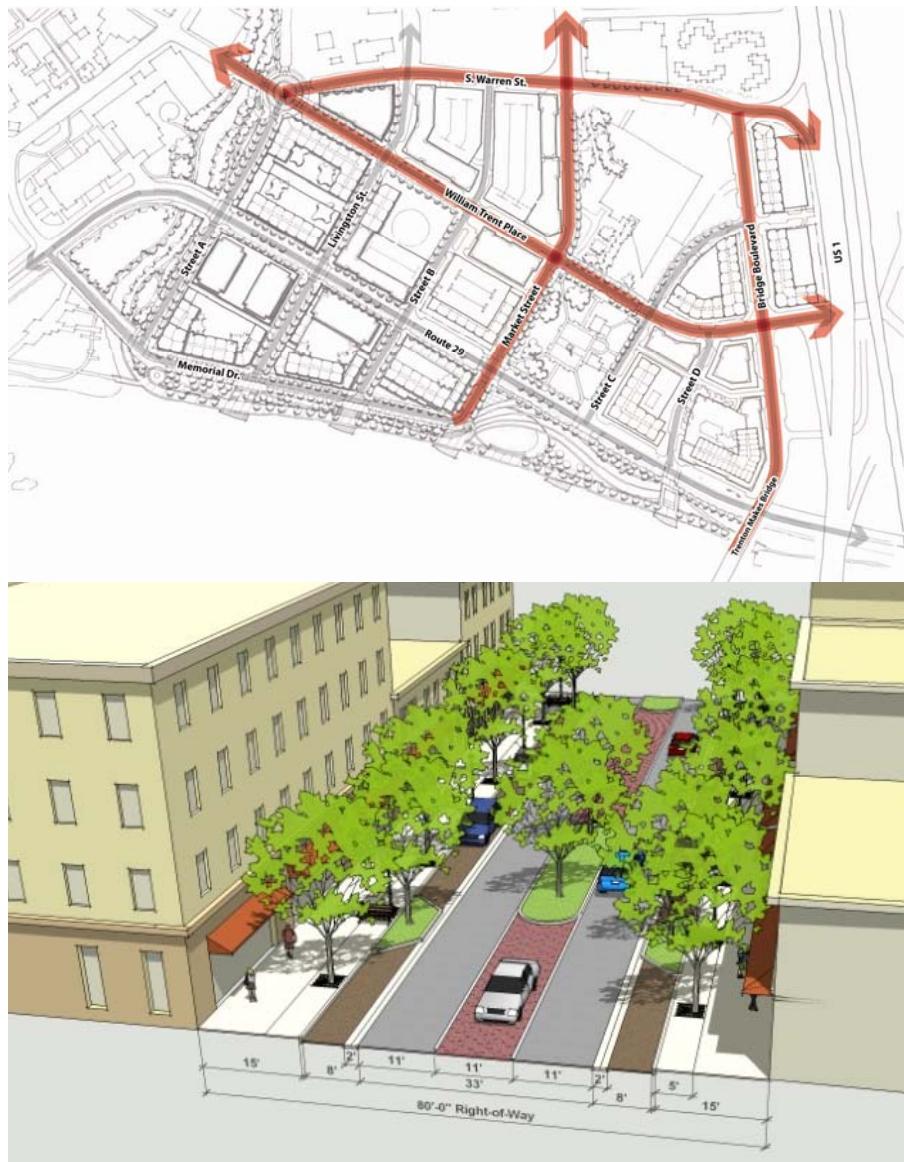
William Trent Place, South Warren Street, Market Street and Bridge Boulevard (80-foot Right-of-Way)
